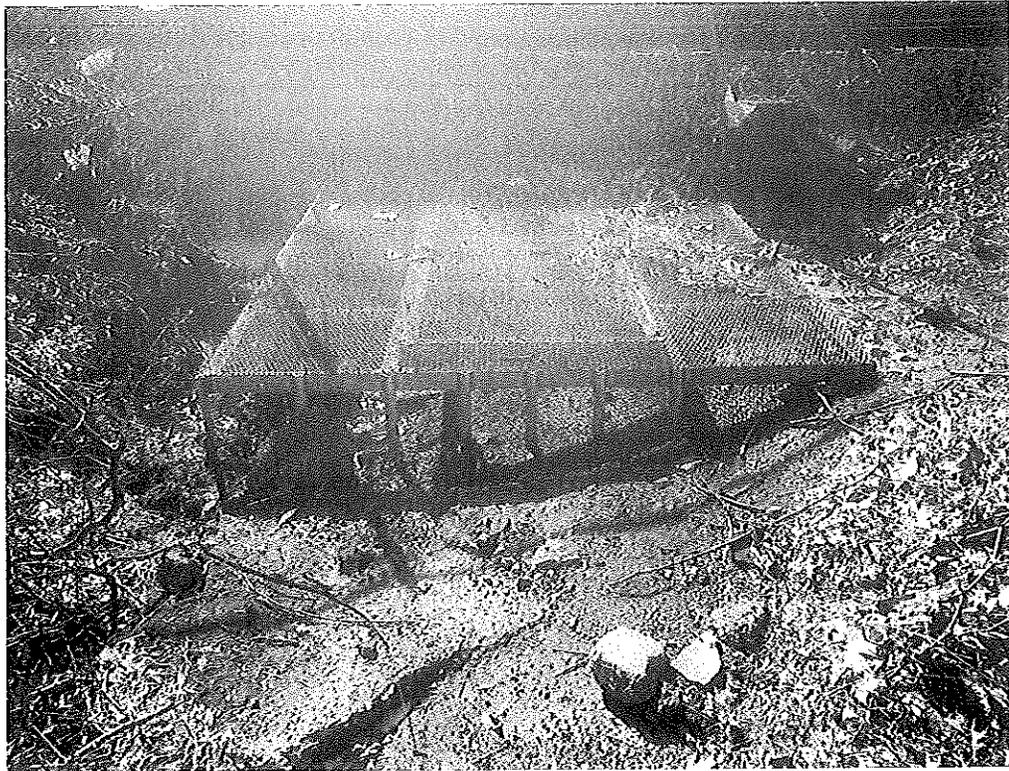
Culvert Submerged Beneath Cage (At Eastern N.Y.S. & W Railway ROW)
